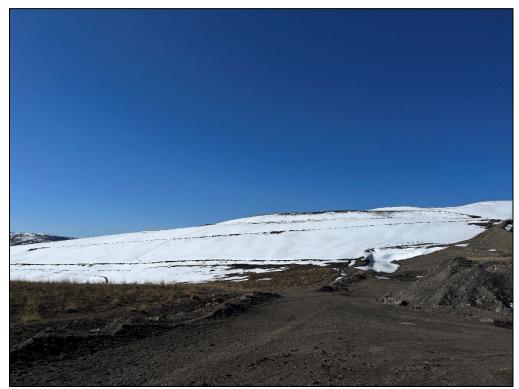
View southeast of Section 15 Ditch, linear feature below is an access road to Section 15 Pond.
